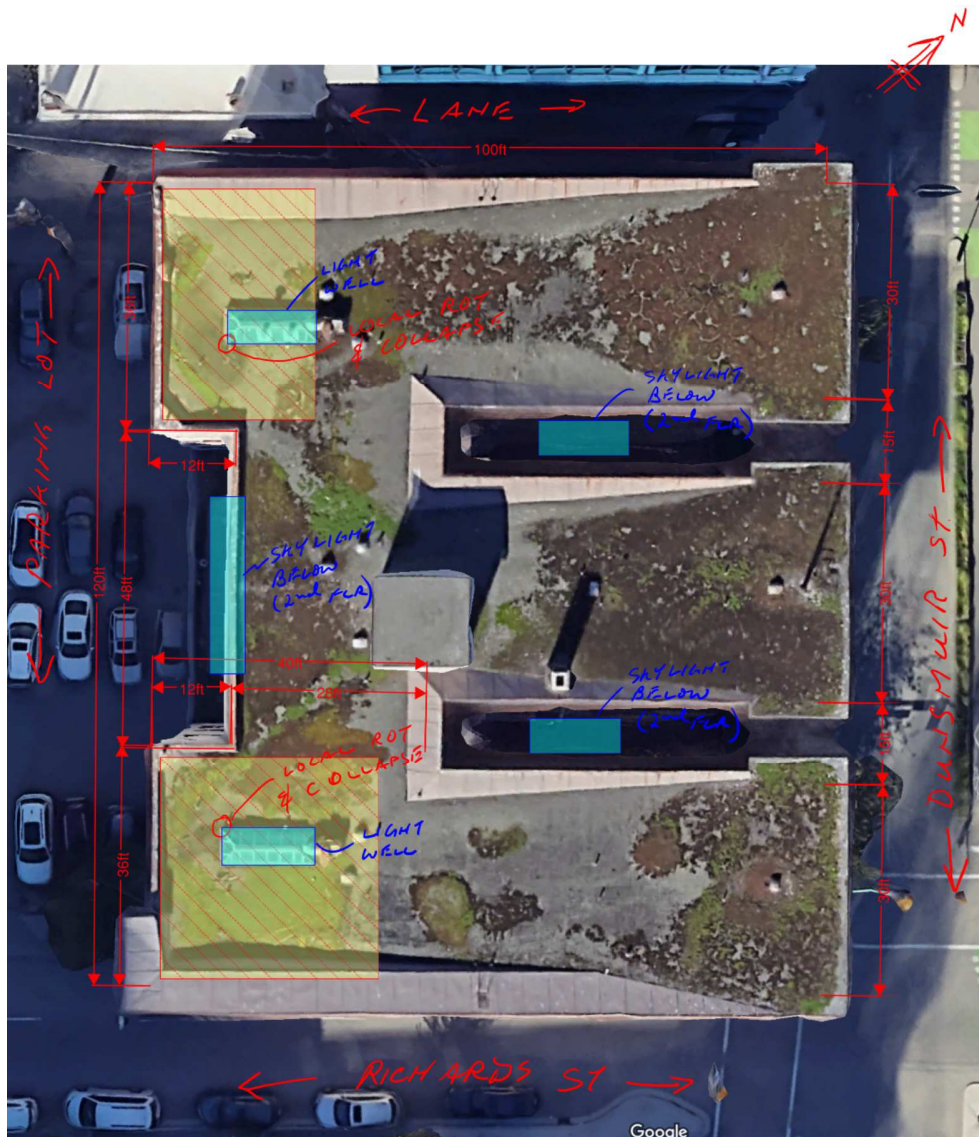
, Site plan with estimated measurements shown and building elements for reference, N.T.S.
